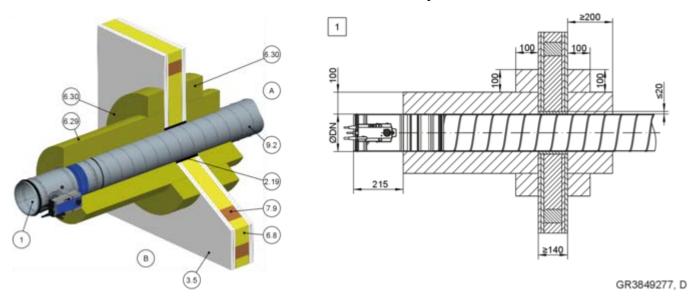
Installation remote from half-timbered walls with mineral wool and joint filler
